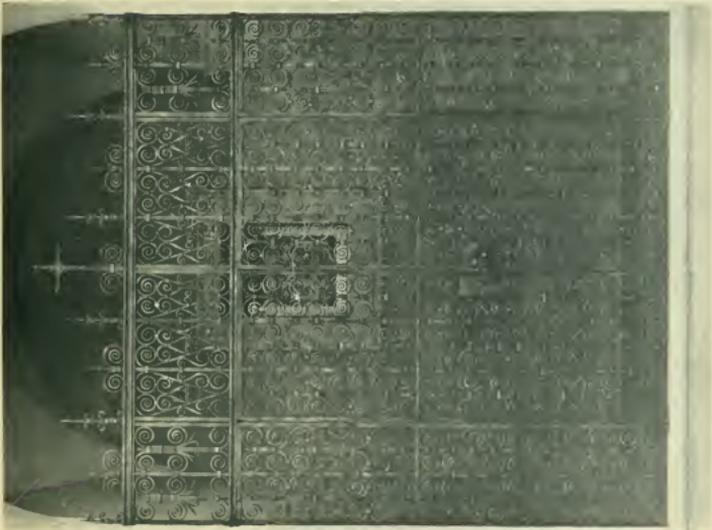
DETAIL AT LOBBY MEZZANINE, FINE ARTS OFFICE BUILDING, LOS ANGELES, CALIFORNIA.
